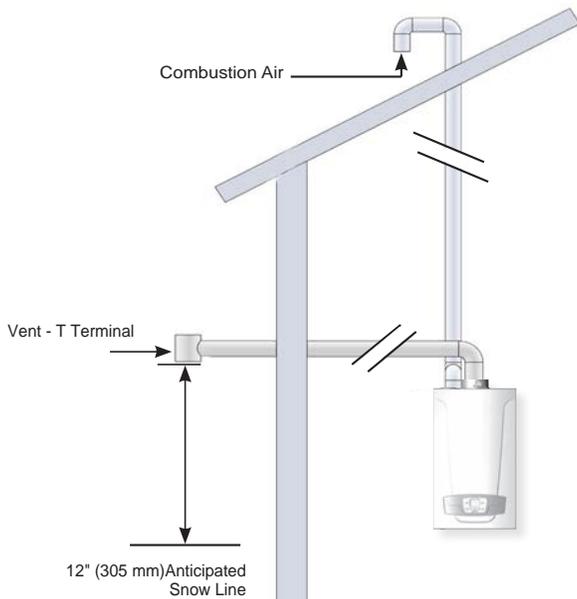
Twin Pipe on Roof Combustion Air On Sidewall
